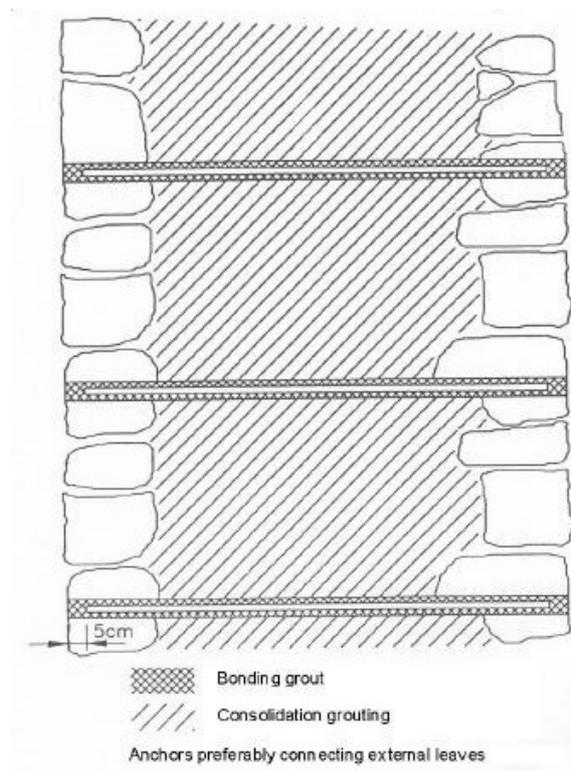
Grouted and Anchored Masonry Wall[9]
